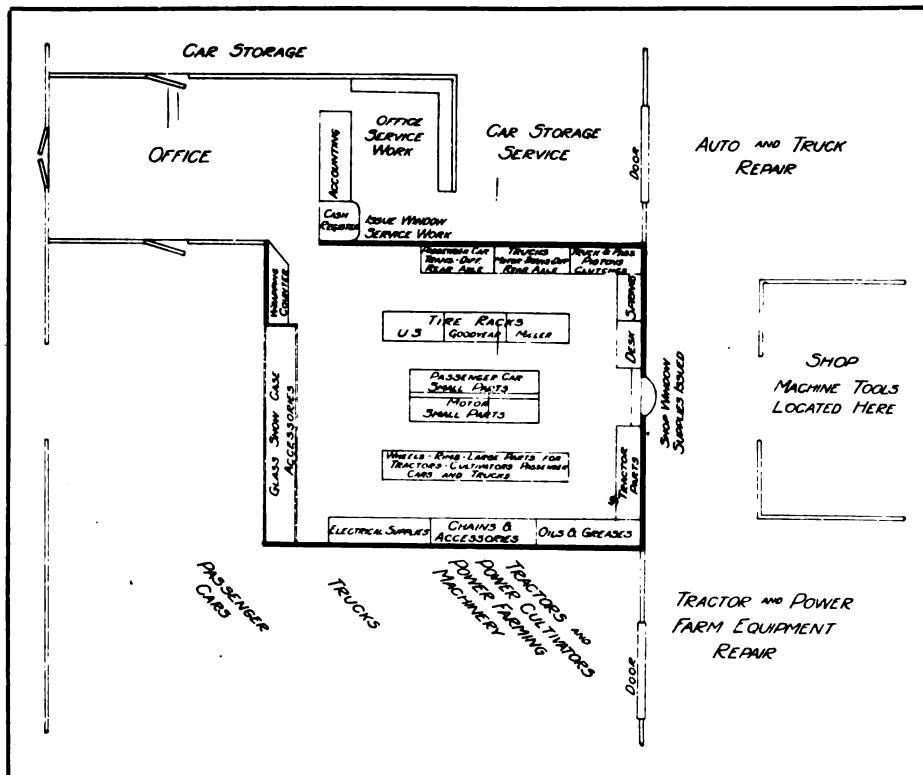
Suggested Storeroom Floor Plan Shows Storage Bin Arrangement.
